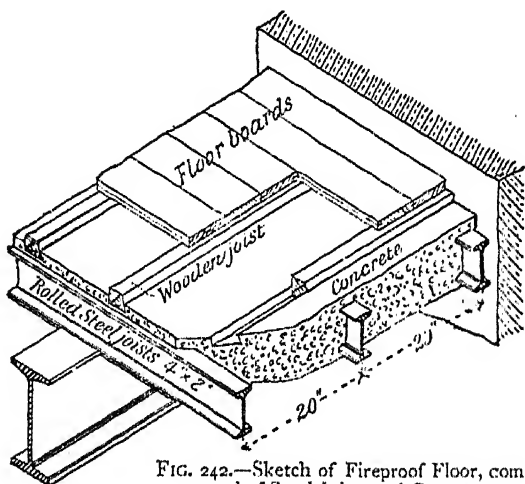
Sketch of Fireproof Floor, composed of Steel Joists and Concrete.
